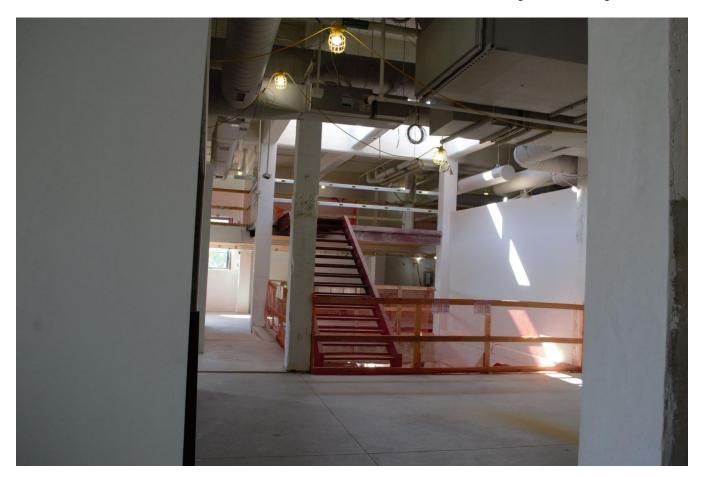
First floor, looking at circular cutouts beneath south mezzanine, looking southeast.
